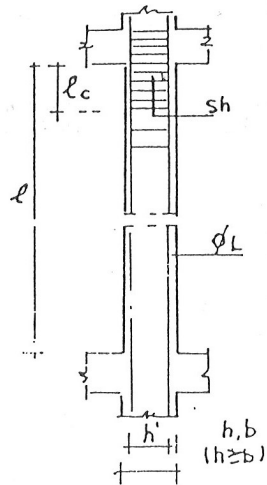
SPECIAL TRANSVERSE REINFORCEMENT
